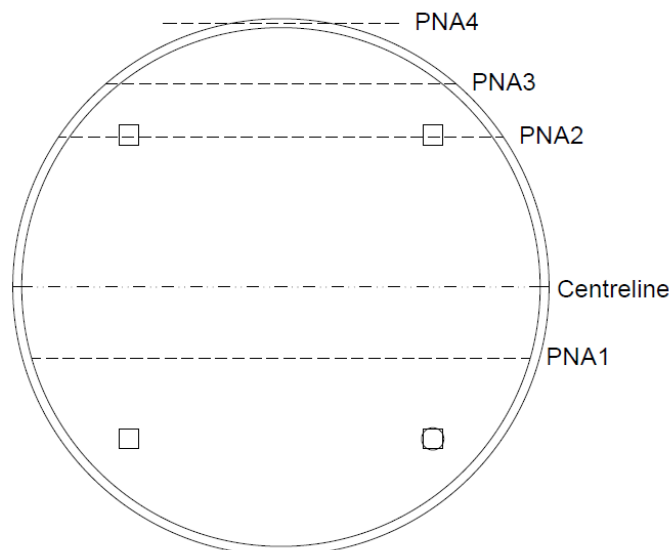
PNA positions on CFT cross-section with 4 rebars
